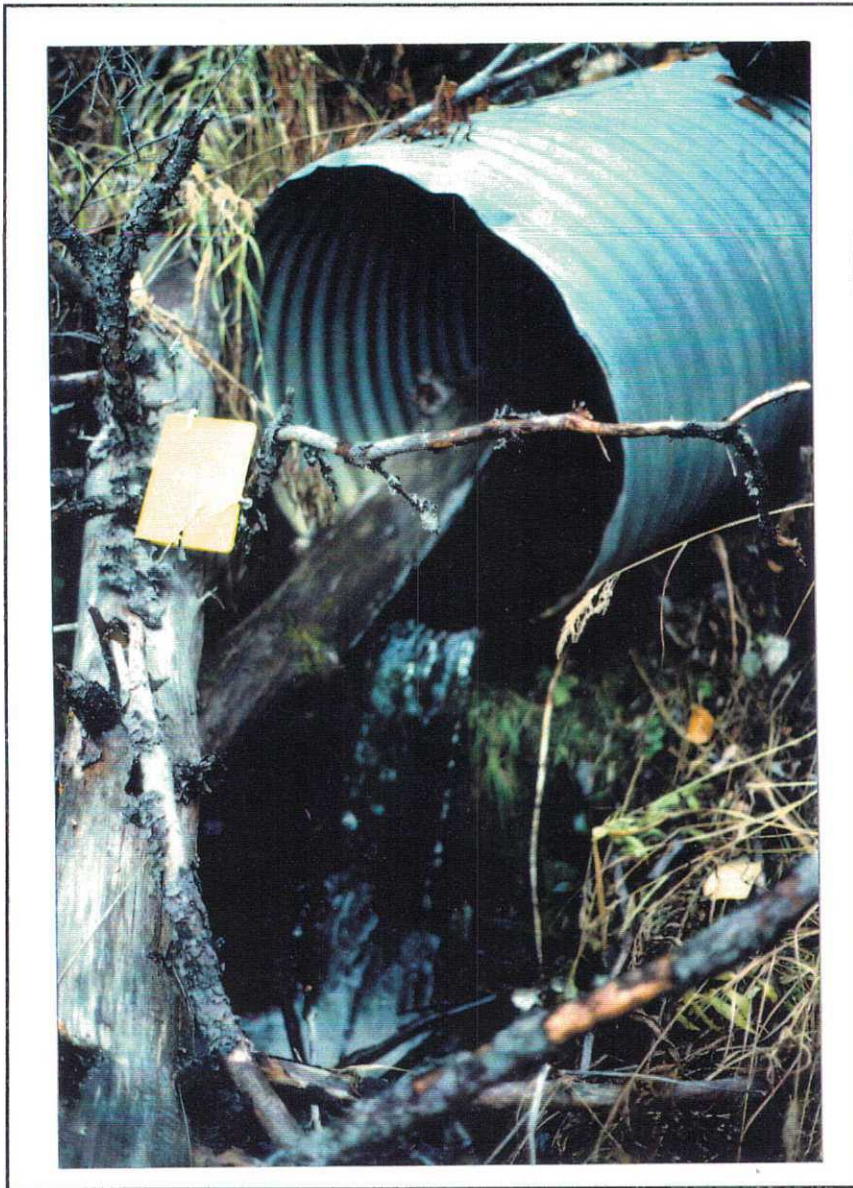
Trib. 46-700-50-14-15 lower spur road crossing (obstruction). One adult cutthroat trout was gee-trapped upstream of this site. This spur road is scheduled for de-activation and the culvert is to be removed.
